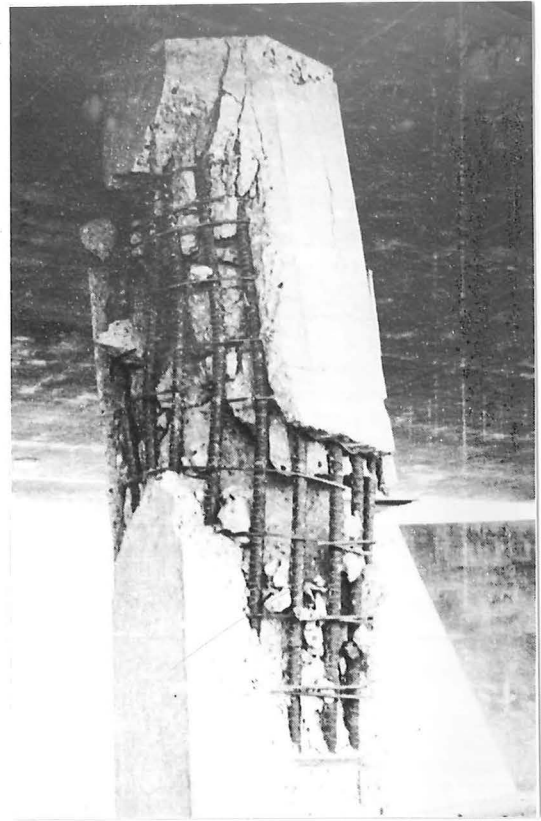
Heavily damaged short columns - 1968 Tokachi Oki Earthquake<sup>1.3</sup>
